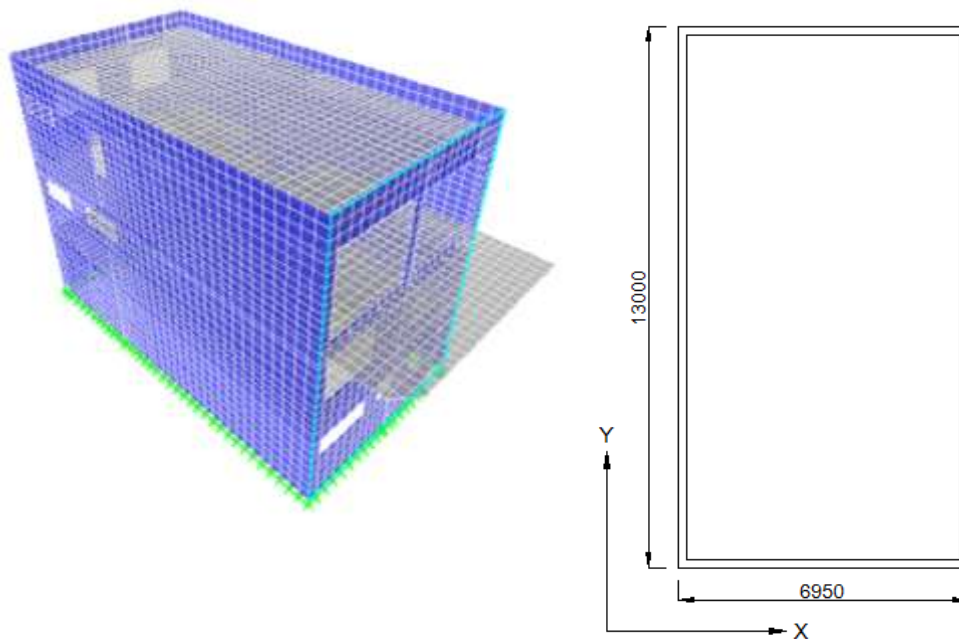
Case study 1. 3D view to left and ground plan of reinforced concrete walls to right.
